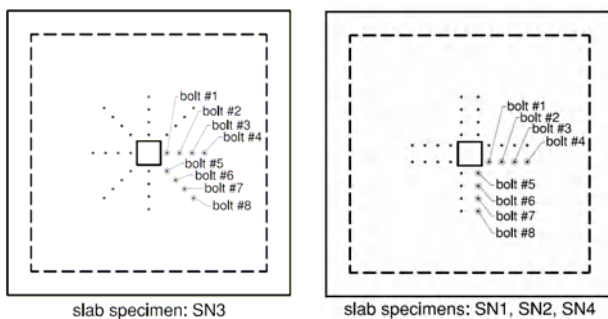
Plan view of the specimens tested in concentric punching showing orthogonal and radial patterns of FRP Bolts
